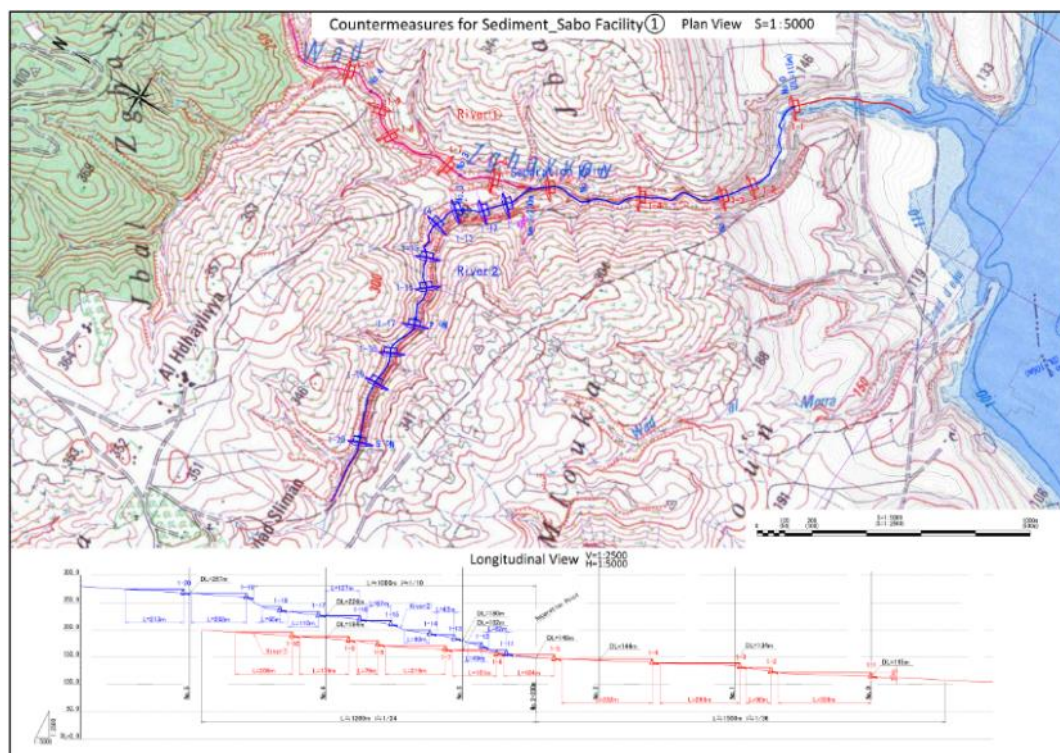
Sabo Facilities Layout Plan (1) Wad Zghayyou River
